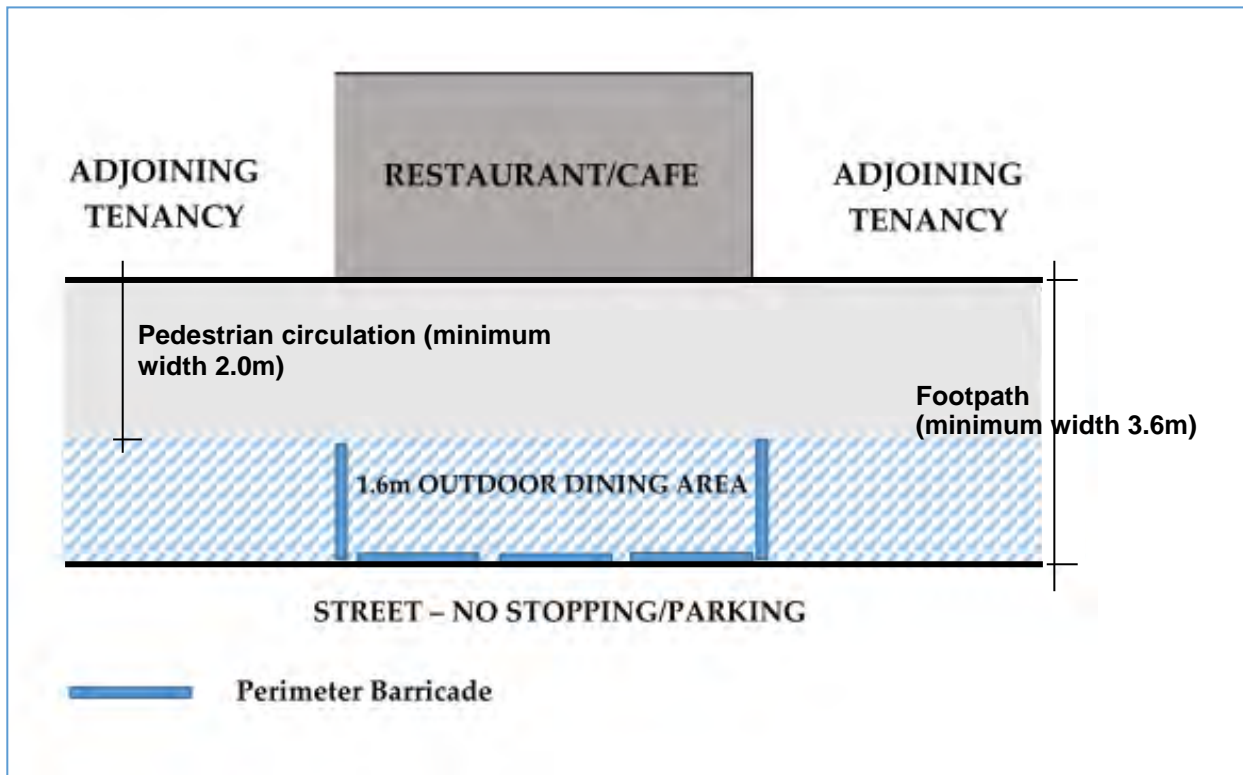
Minimum dimensions for outdoor dining on primary retail streets not adjoining car parking.
